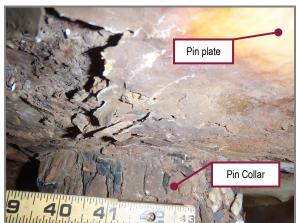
Heavy laminate rusting at the lower hanger pin collar at the South Truss Floorbeam 4' connection.
